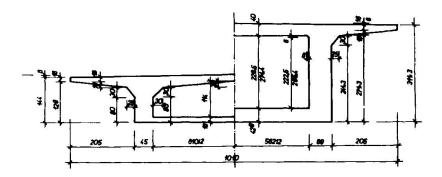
A scheme of cross-section of the bearing structure of the bridge Kollárovo.
